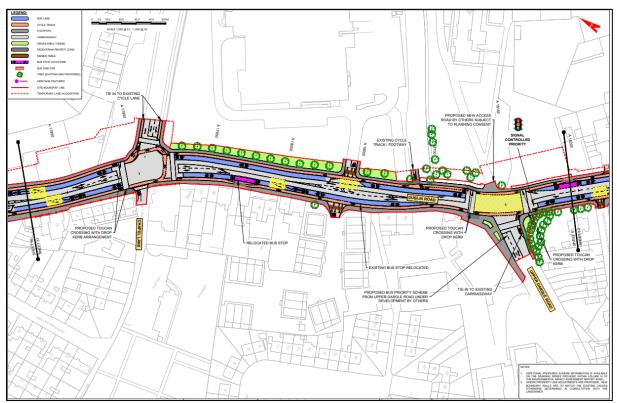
Extract from General Arrangement Drawing at Dublin Road / Upper Dargle Road junction (Sheet 51)
